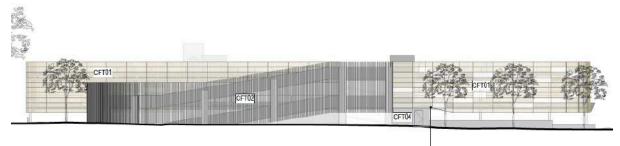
Proposed car park east elevation (Source: Gray Puksand)
